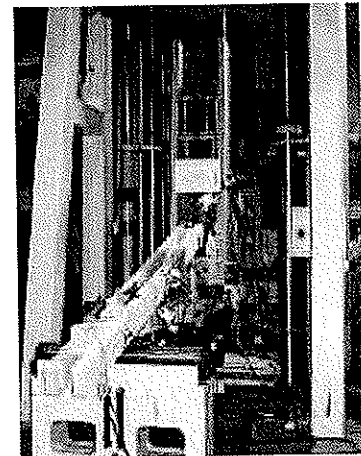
Test set-up for vertical two-points loading on bolted LVL trusses.
